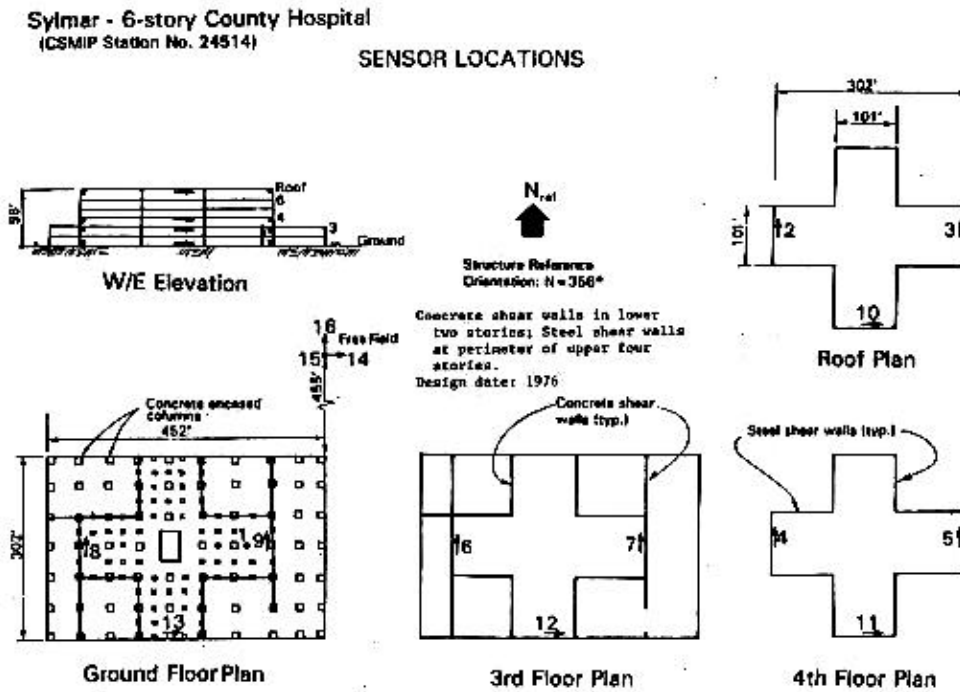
Plan views and elevation of instrumented Sylmar hospital in Los Angeles (CSMIP, 1994)
